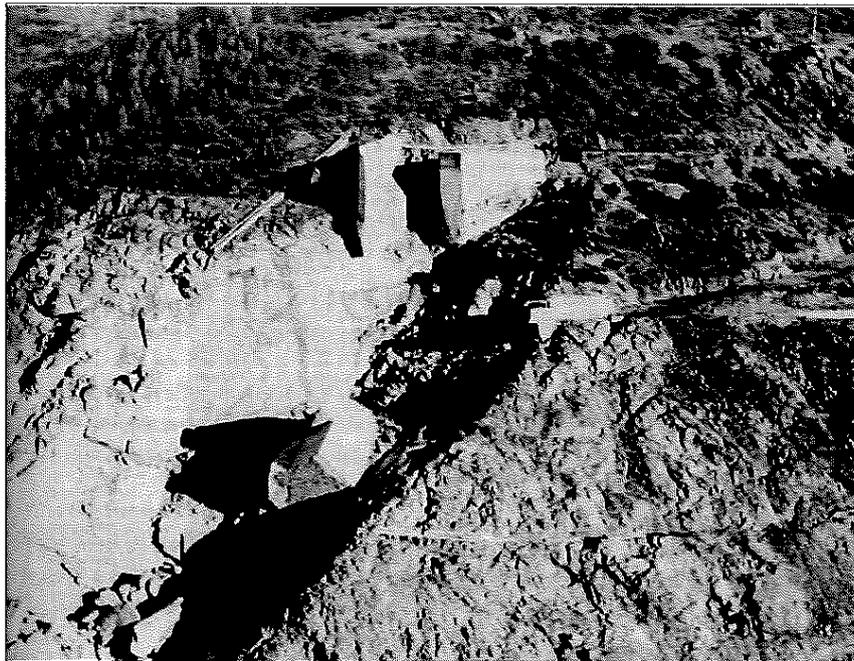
Left abutment after failure. Note upstream dipping fault and downstream dipping foliation shear (after Post and Bonazzi, 1987)
